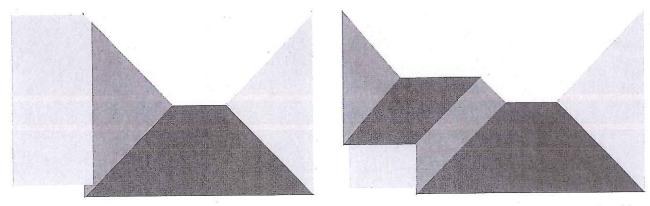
Roof plans amended to reflect Condition 1(i), either as a skillion over the garage/laundry, or a secondary hip.
